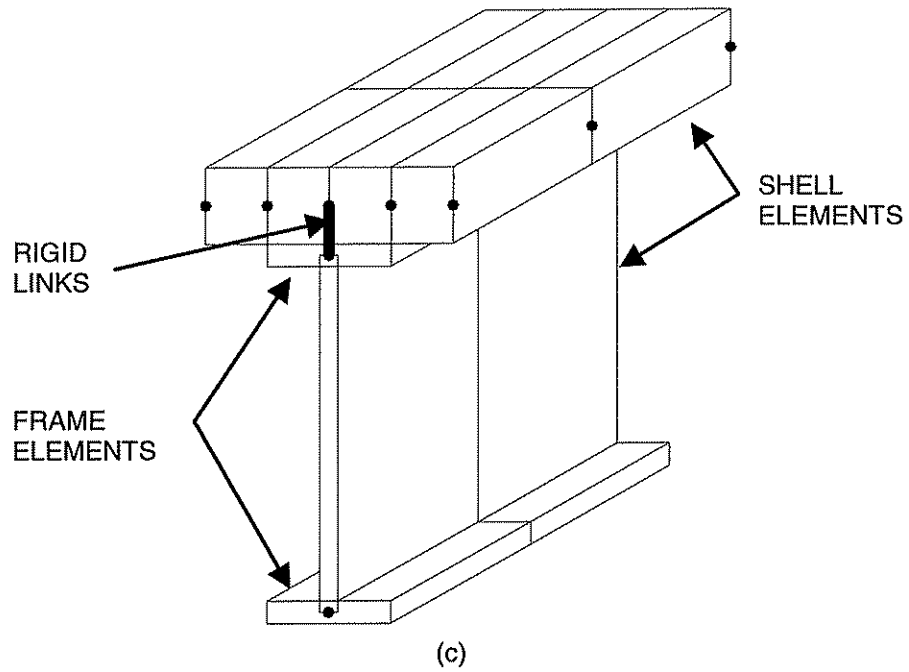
(Cont.). Previous finite element arrangements used to model composite action between a reinforced concrete deck and supporting steel girders: (c) Mourad and Tabsh (1999); (d) Cao and Shing (1999).
